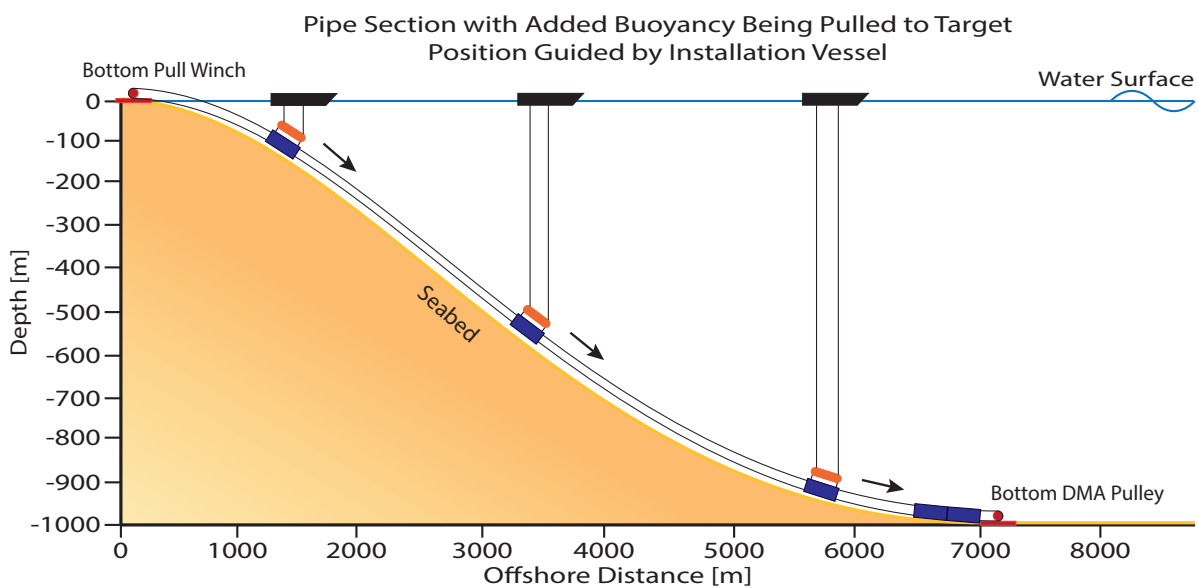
Bottom Pull Sub-Sea Joining Installation Method Procedure
